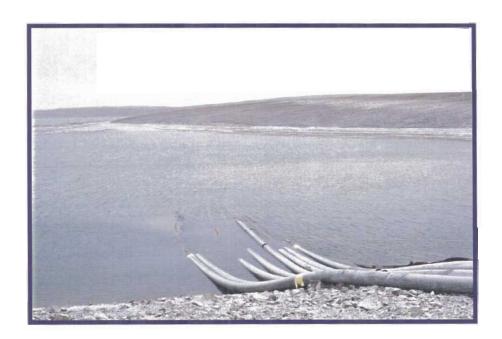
Garrow Lake Dam intake area of siphon pipes.
